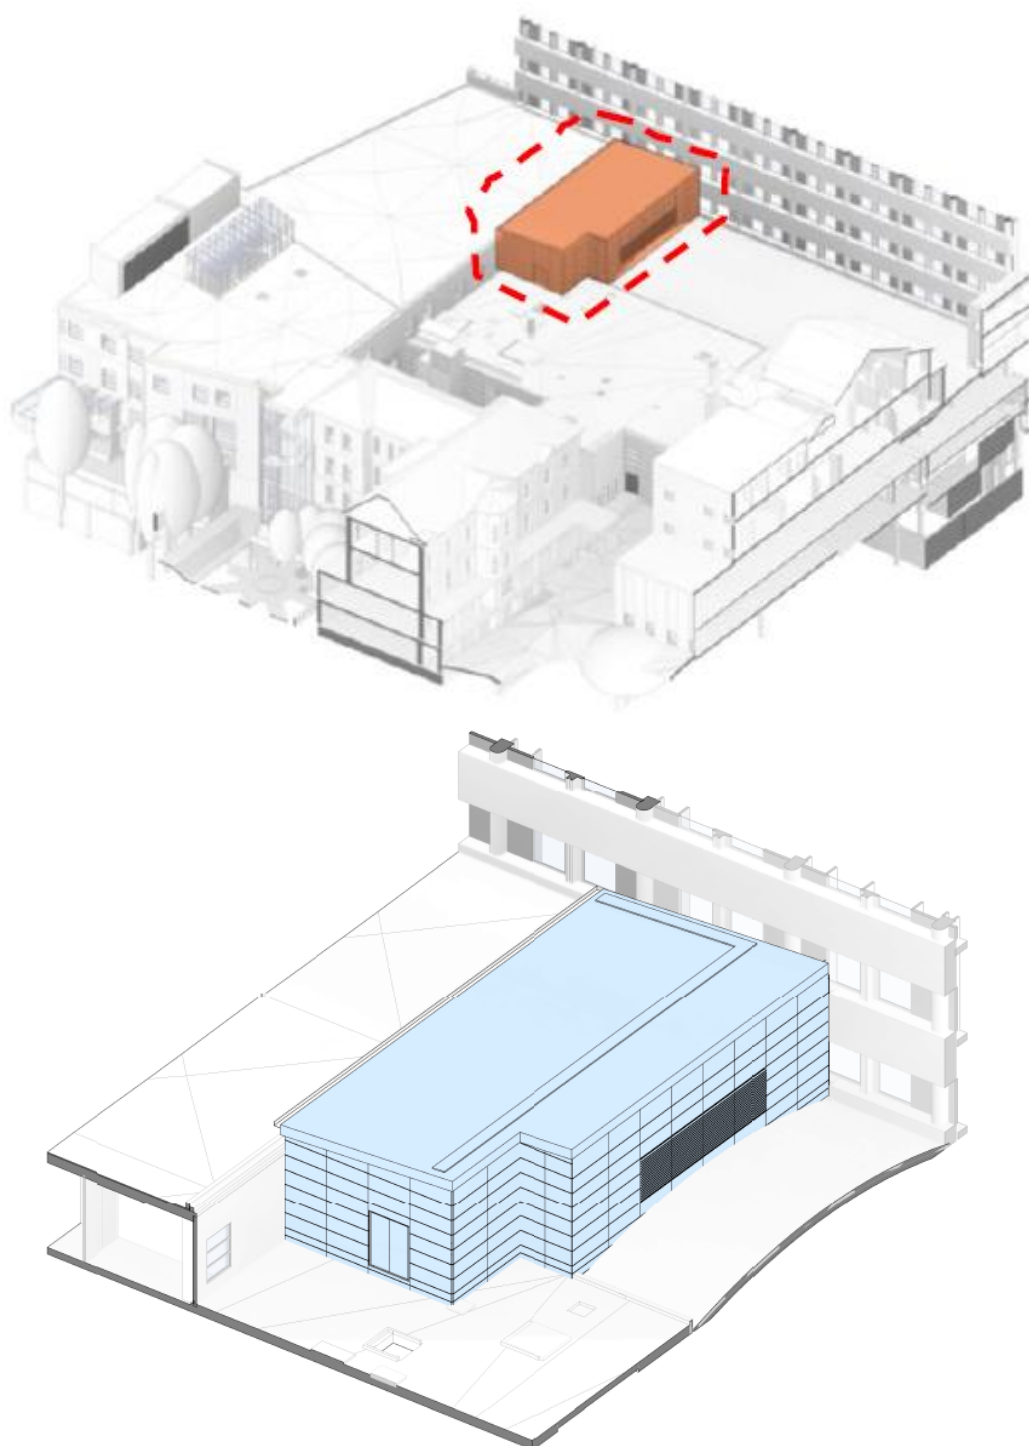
Indicative view of the proposed Level 6 plant room from above B89
